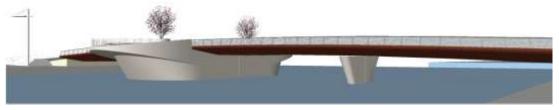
Proposed Dodder Bridge (View from Thorncastle Street)
